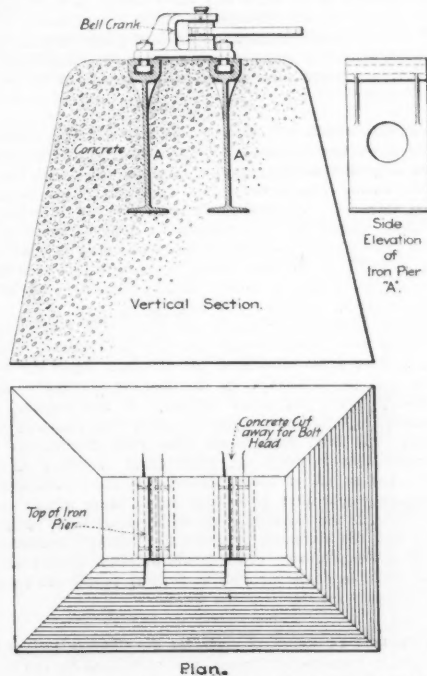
Iron and Concrete Foundation in Signal Work. National Switch and Signal Co., Makers.
